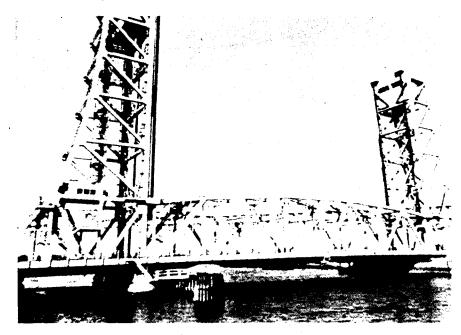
Vertical Lift Bridge with Power and Drive System on Towers
